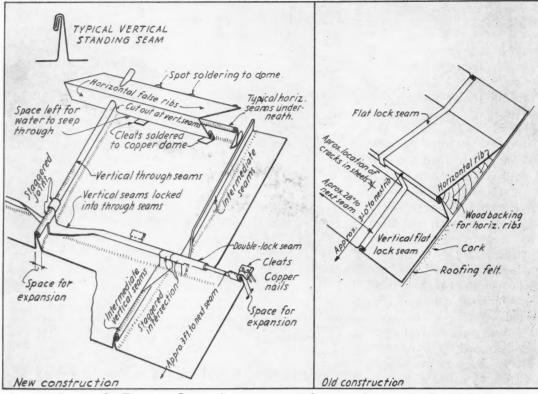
Old dome construction showing integral "step" and seaming. These steps were continuous around the dome and were not broken by vertical expansion seams. In the new construction (left) the "steps" are only tack-soldered strips. Through, vertical seams are true expansion seams and the intermediate, vertical seams were locked loosely to provide additional expansion space. Note how meeting seams are folded together.
